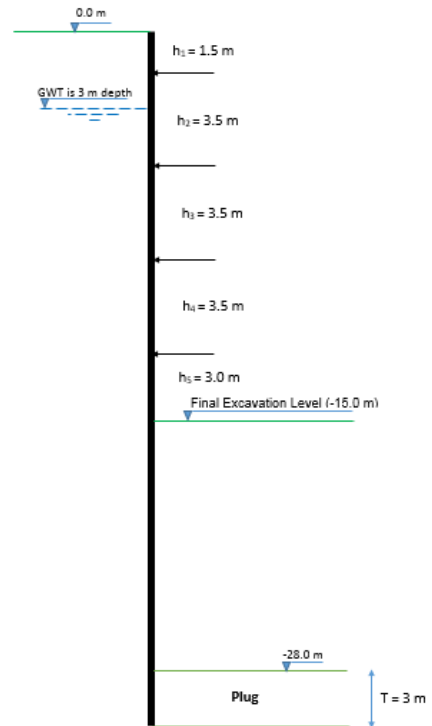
Cross section of the considered deep excavation system (Excavation Height = 15 m)
